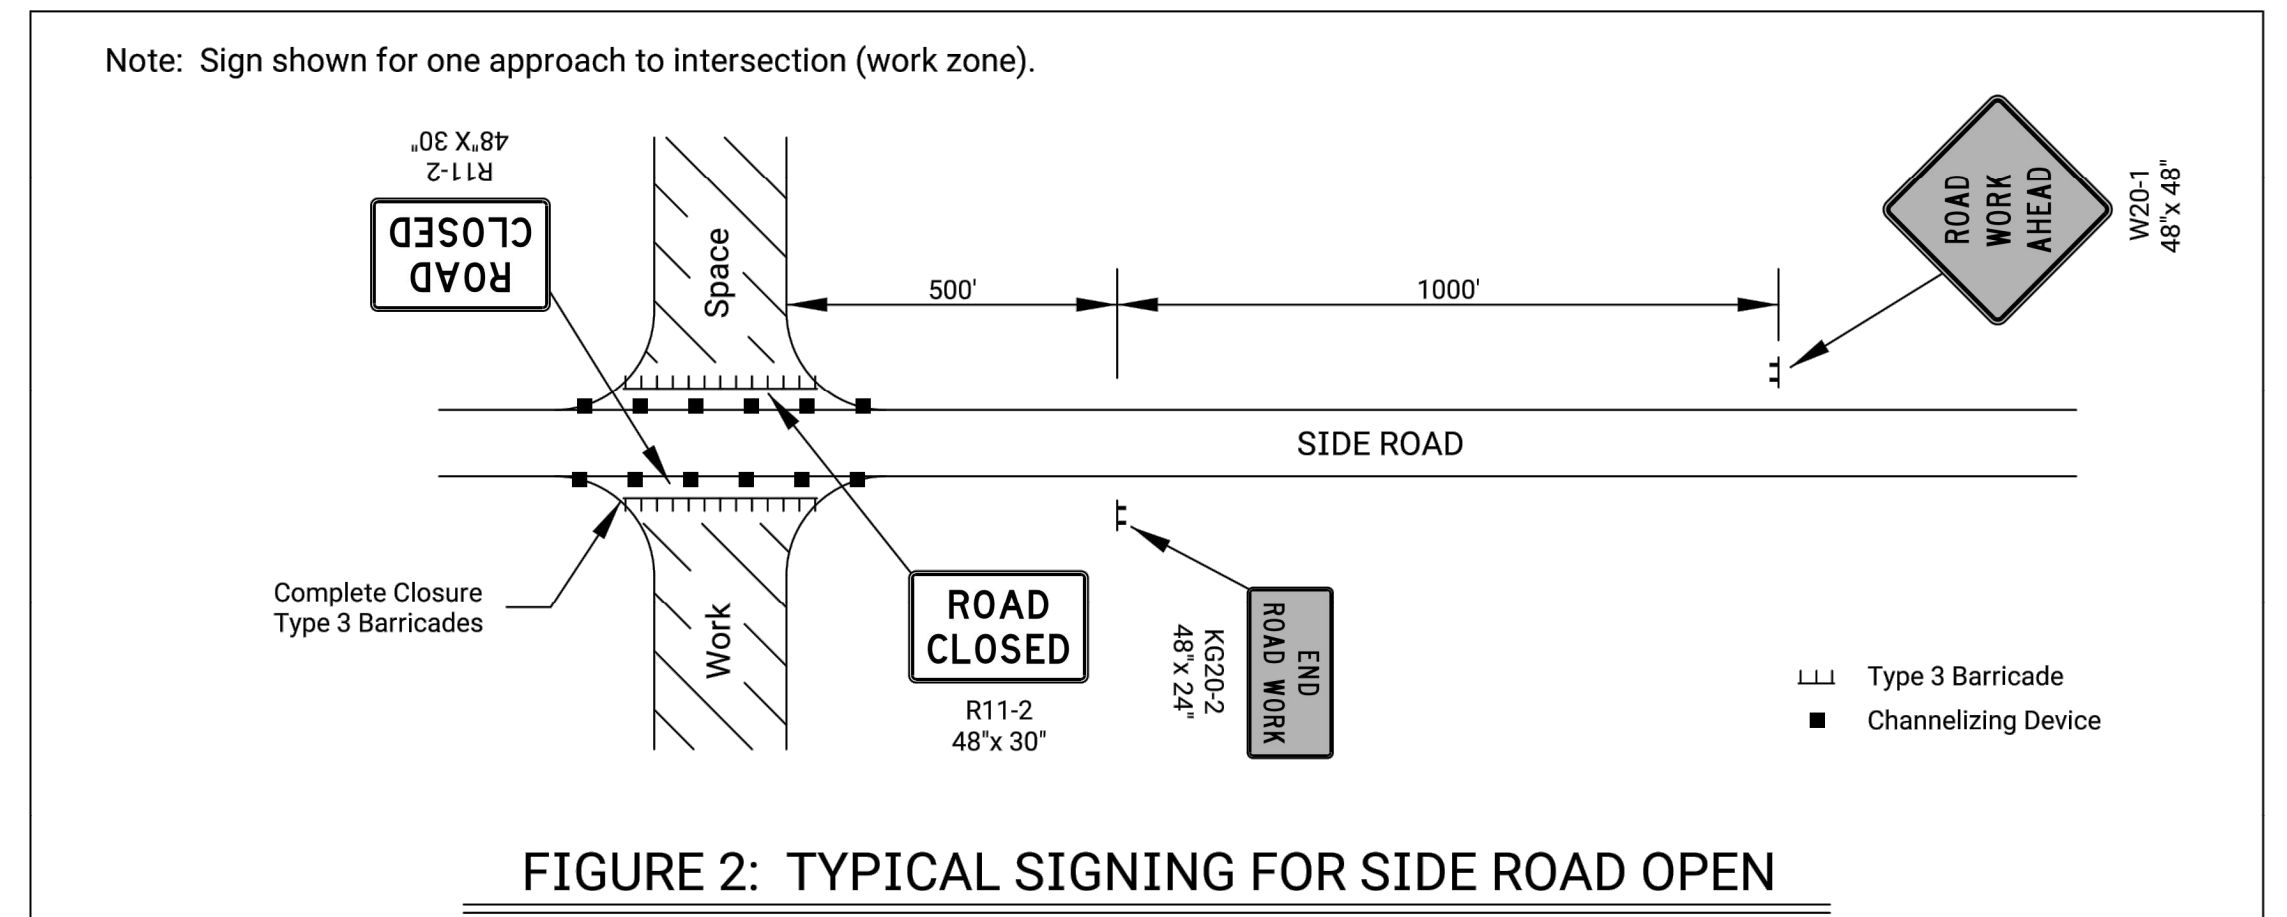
TYPICAL SIGNING FOR SIDE ROAD OPEN
